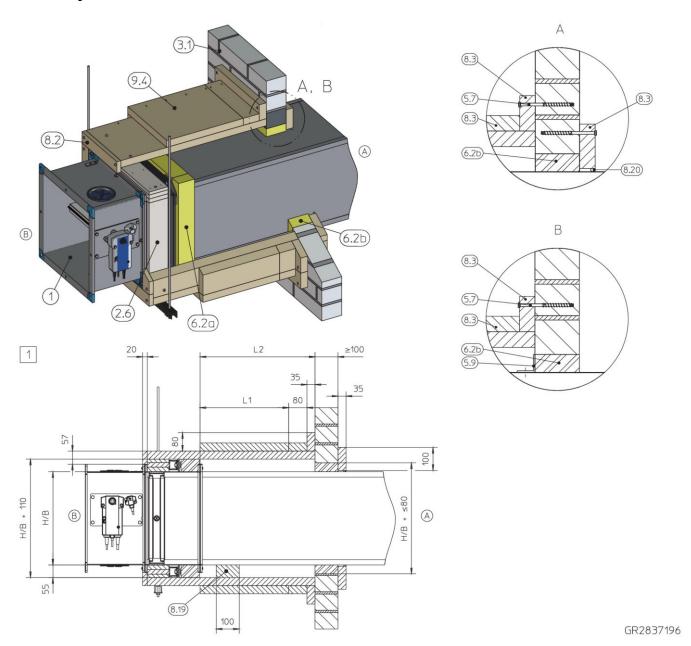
Dry mortarless installation with installation kit WE, remote from a solid wall
